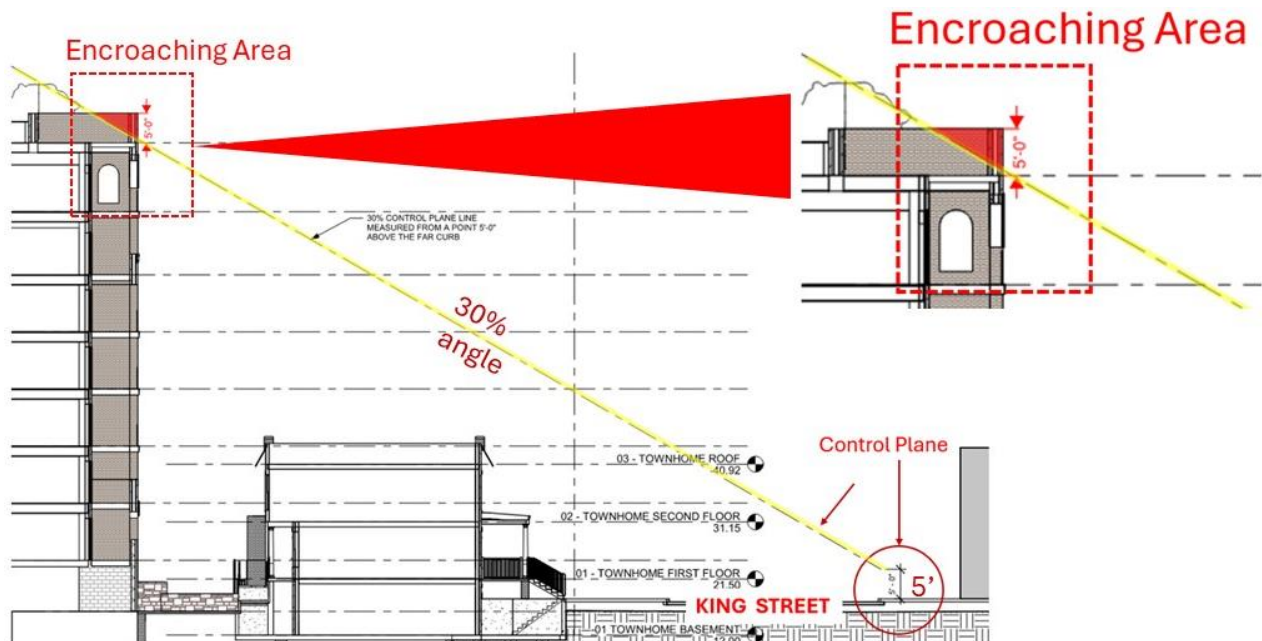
Portion (in red) of the new building that does not comply with the recommended 30-degree building envelope starting from King Street
